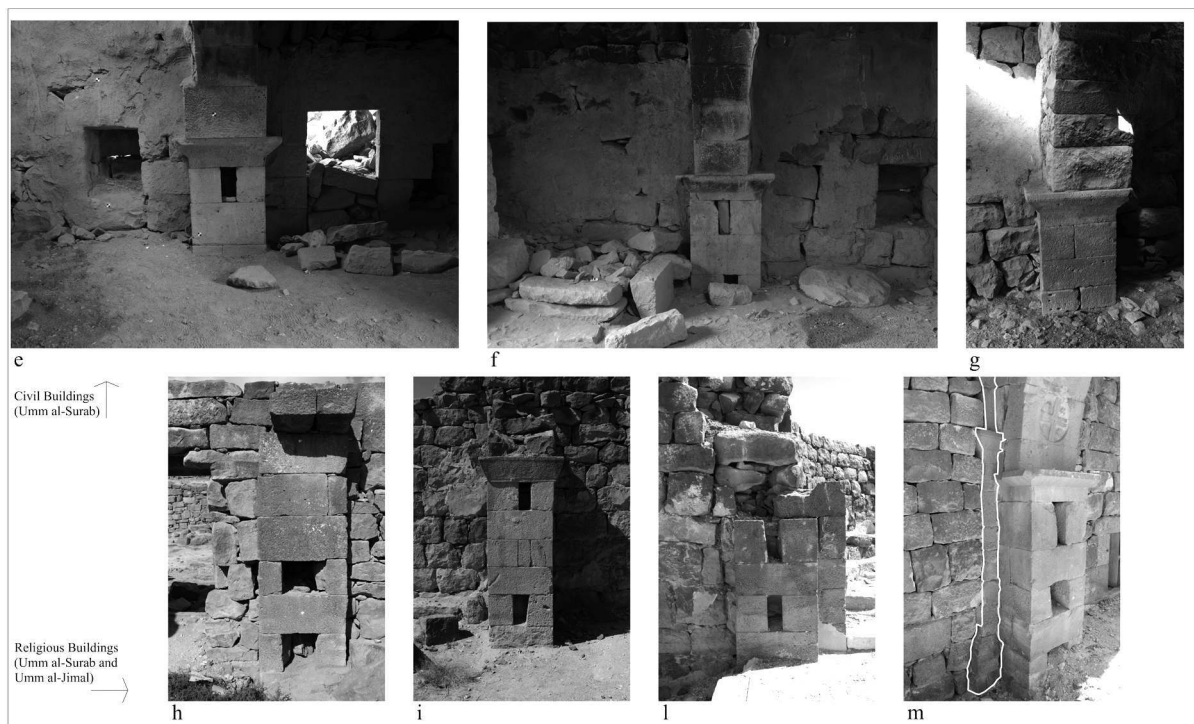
Piers and capitals from civil buildings in Umm al-Surab: e. TU 24, BE 2B, west wall; f. TU 24, BE 2B, east wall; g. comparison with TU 16. Piers and capitals from religious buildings from Umm al-Surab: h. northern pier of the Church of the Saints Sergius and Bacchus and from Umm al-Jimal: i. and l. from the so-called Cathedral and m. from the West church, where it is possible to observe the presence of the two different piers with capitals © P. Gilento.
